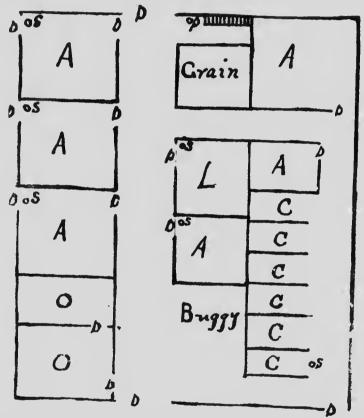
Ground floor plan of barn shown in figure 91. A-box stalls; C- open stalls; O- office; L--breeding room; S--sewer.
